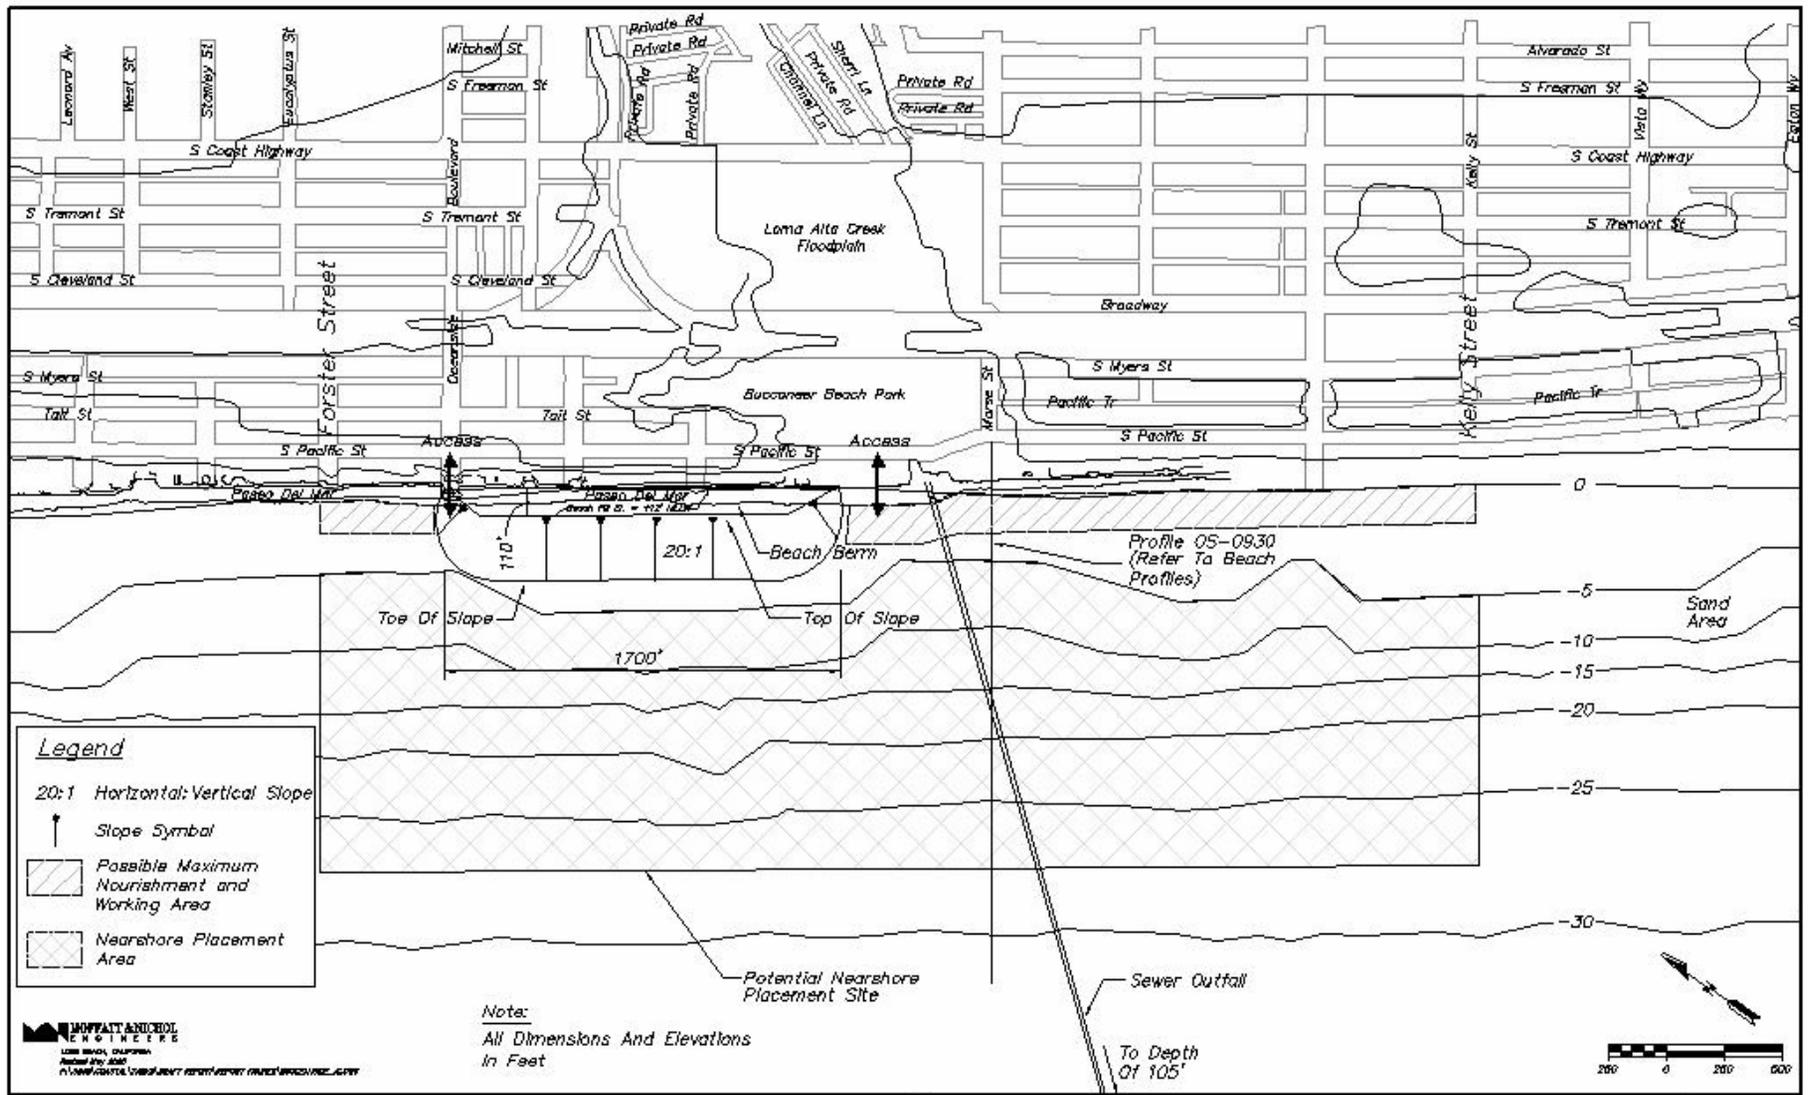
Example Beach Fill Berm Plan for the South Oceanside Site
